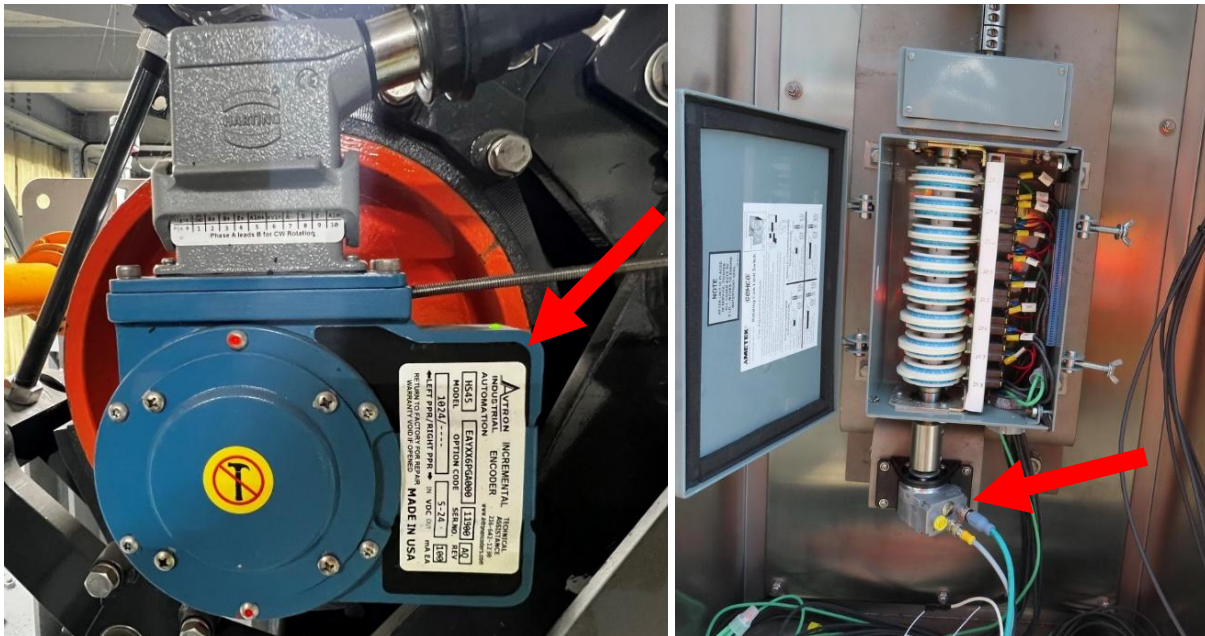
Encoder mounted to a span motor shaft(left) and mounted to a span skew rotary cam limit switch shaft(right).
